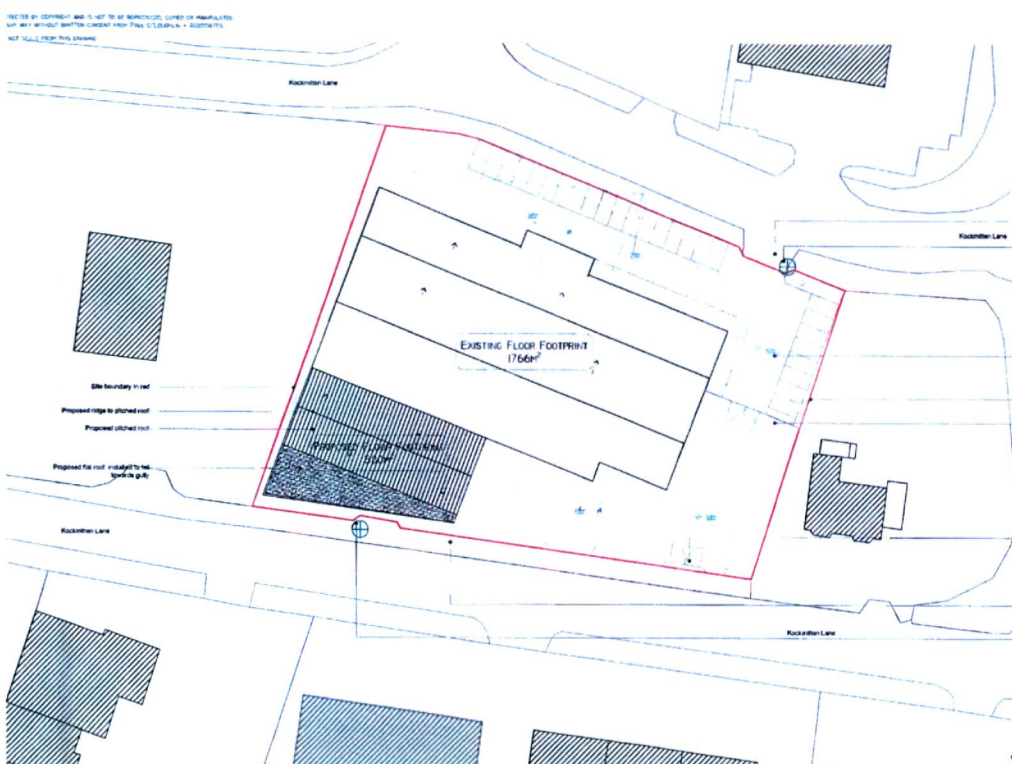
Extract of the Layout Plan of the development under Reg. Ref.: SD19A/0025
